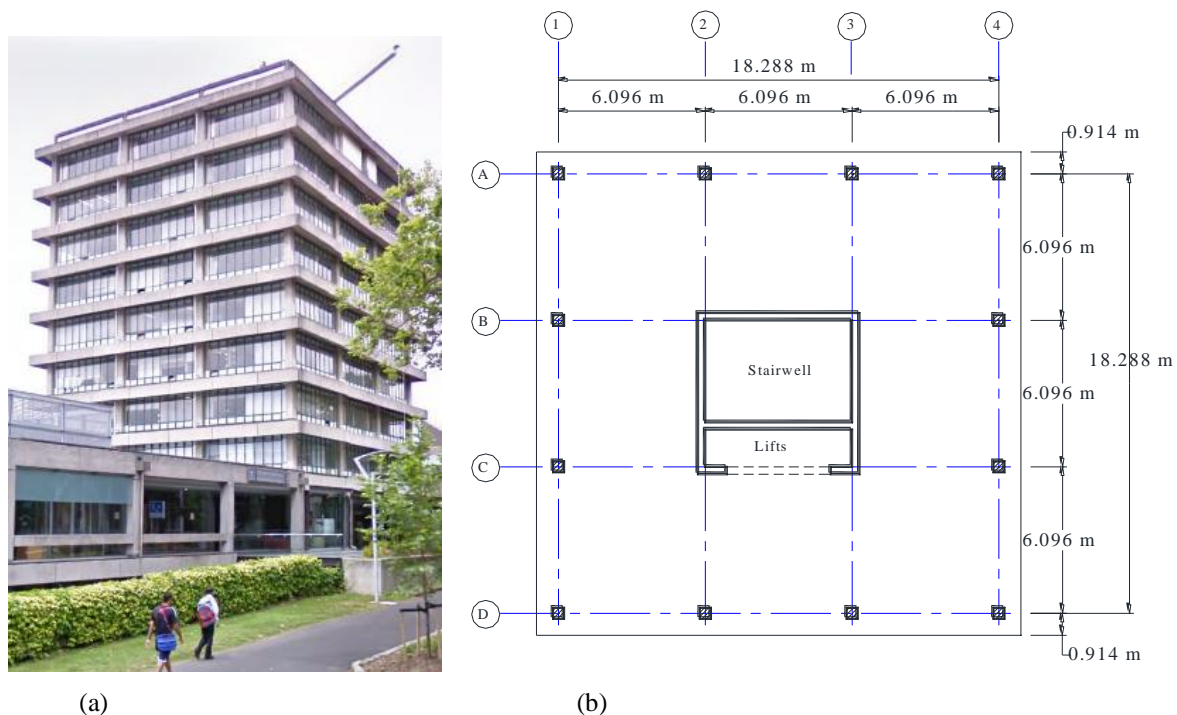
(a) Engineering office building at the University of Auckland, (b) Plan view of levels 5 to 12.
